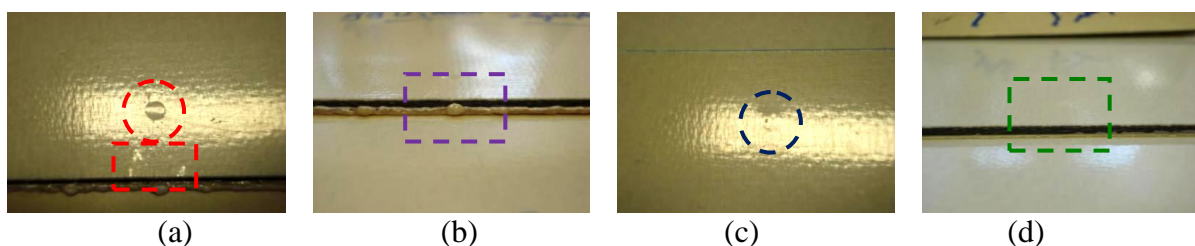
PPS-C test coupon impacted at 10 J: (a) Impacted side; (b) Corresponding weldline; (c) Rear side; (d) Respective weldline.
